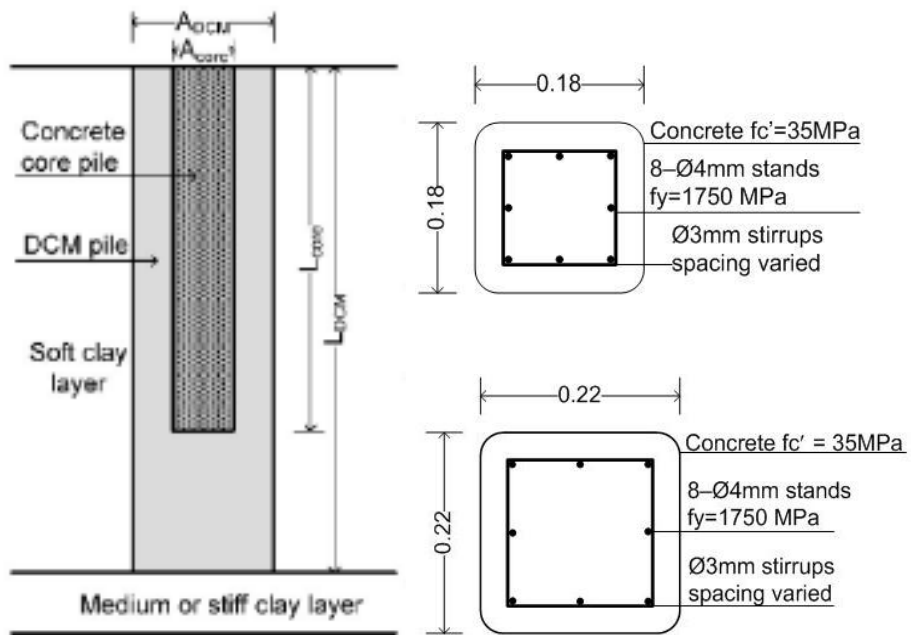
Schematic of SDCM and the details of pre-stressed concrete core piles
